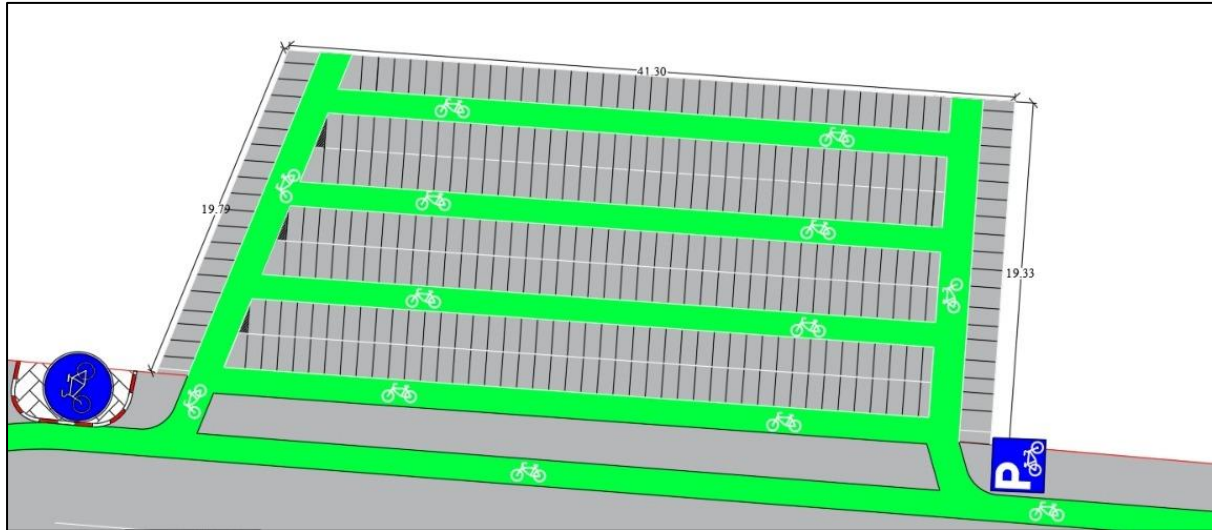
25: Bikes Parking Lot, An- Najah New Campus
